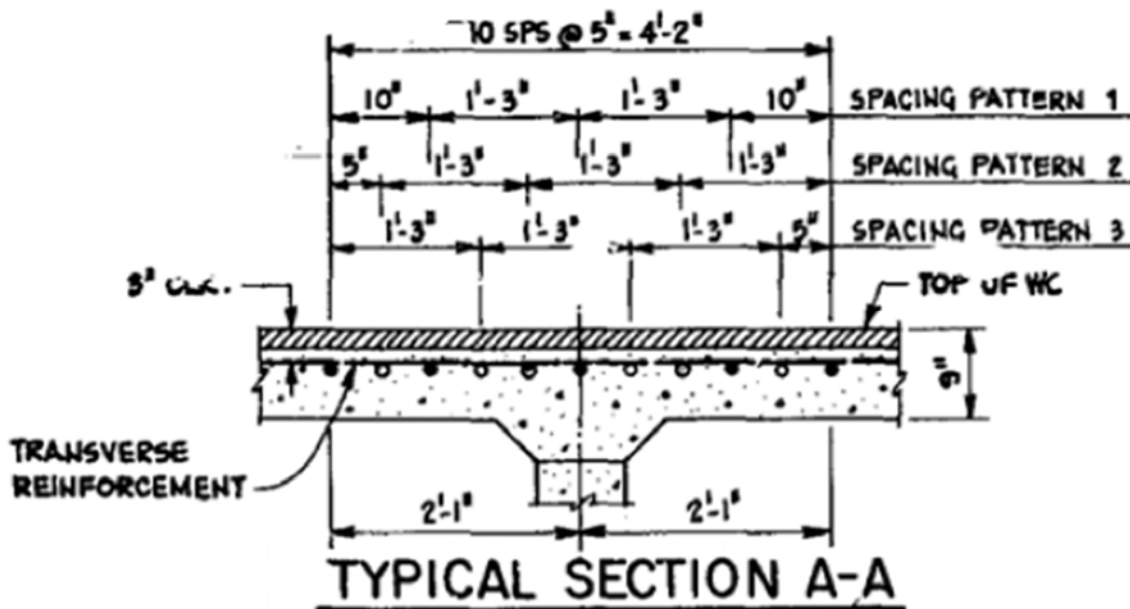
Showing top slab reinforcement and 3-inch top concrete cover (1" in structural slab and 2-inch additional provided by concrete wearing course). The top reinforcement is epoxy coated in accordance with 1982 specifications.
